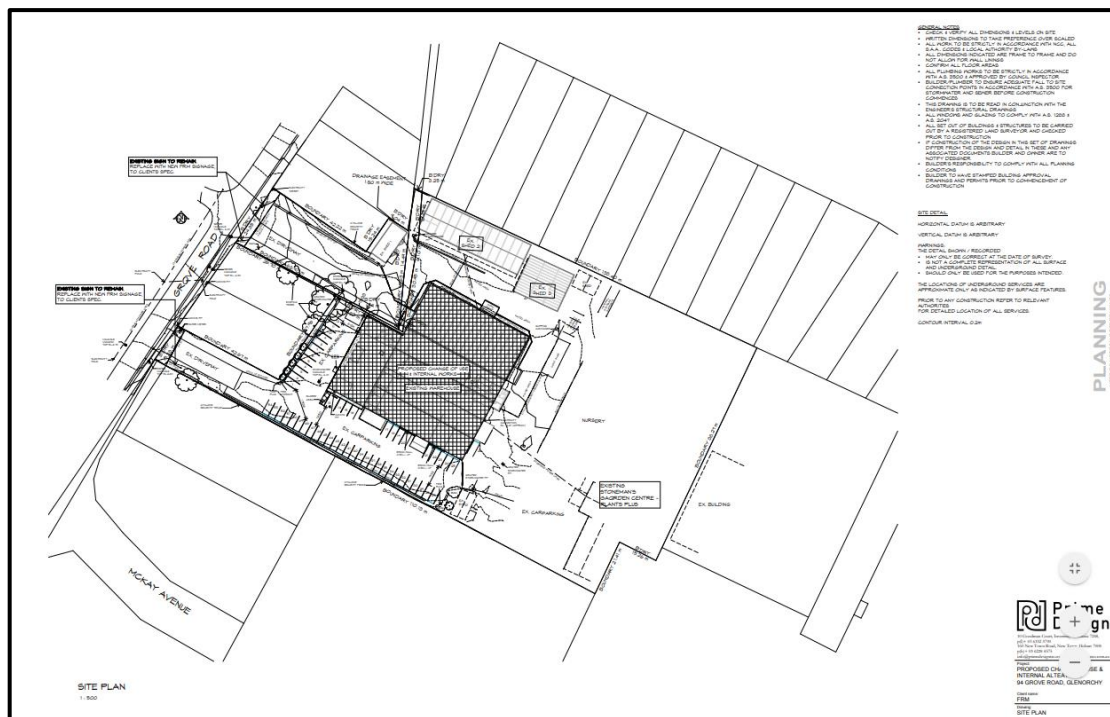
Site Plan for 94 Grove Road, Glenorchy.
